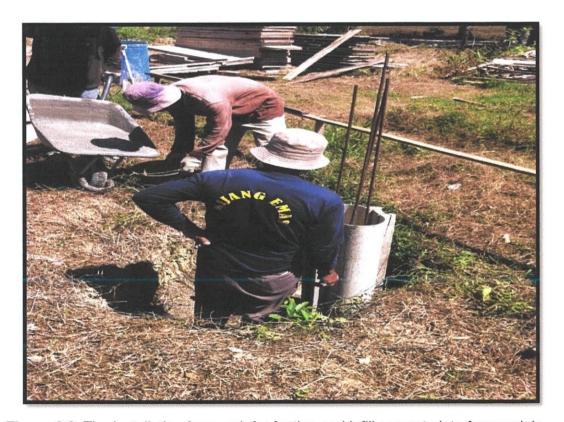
The installation formwork for footing and infill concrete into formwork in doing by using wheelbarrow.
